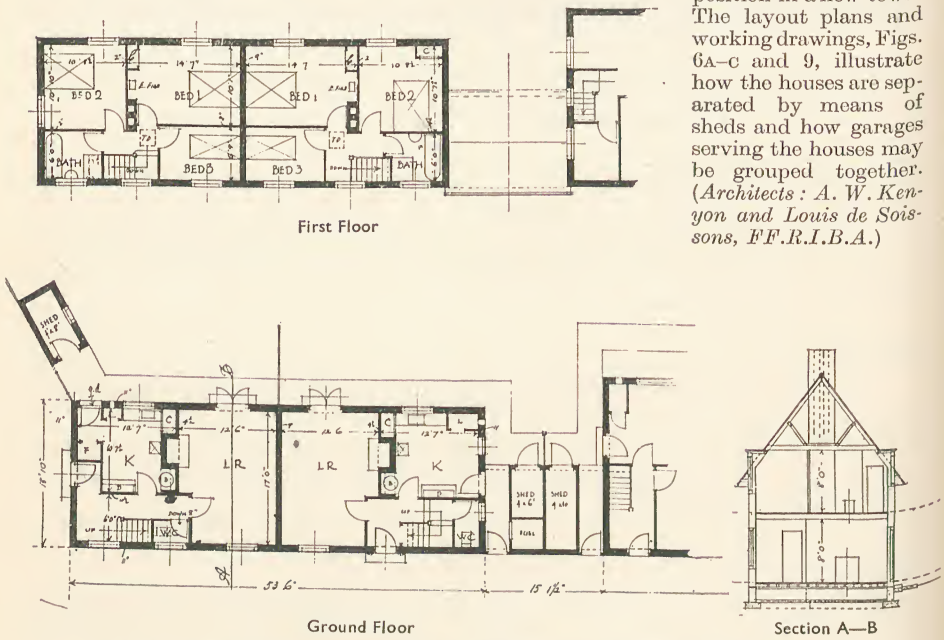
A.—PLANS OF HOUSES 1 AND 2, PARKWAY, WELWYN GARDEN CITY
